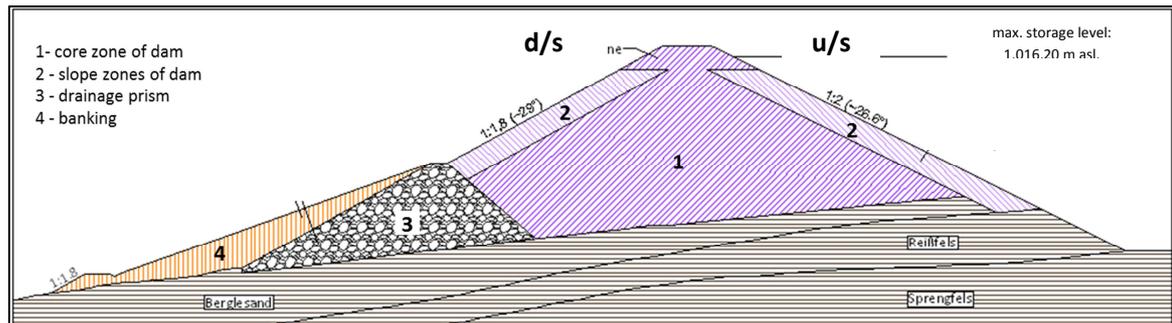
Cross section of the planned dam; d/s – downstream side; u/s – upstream side.
